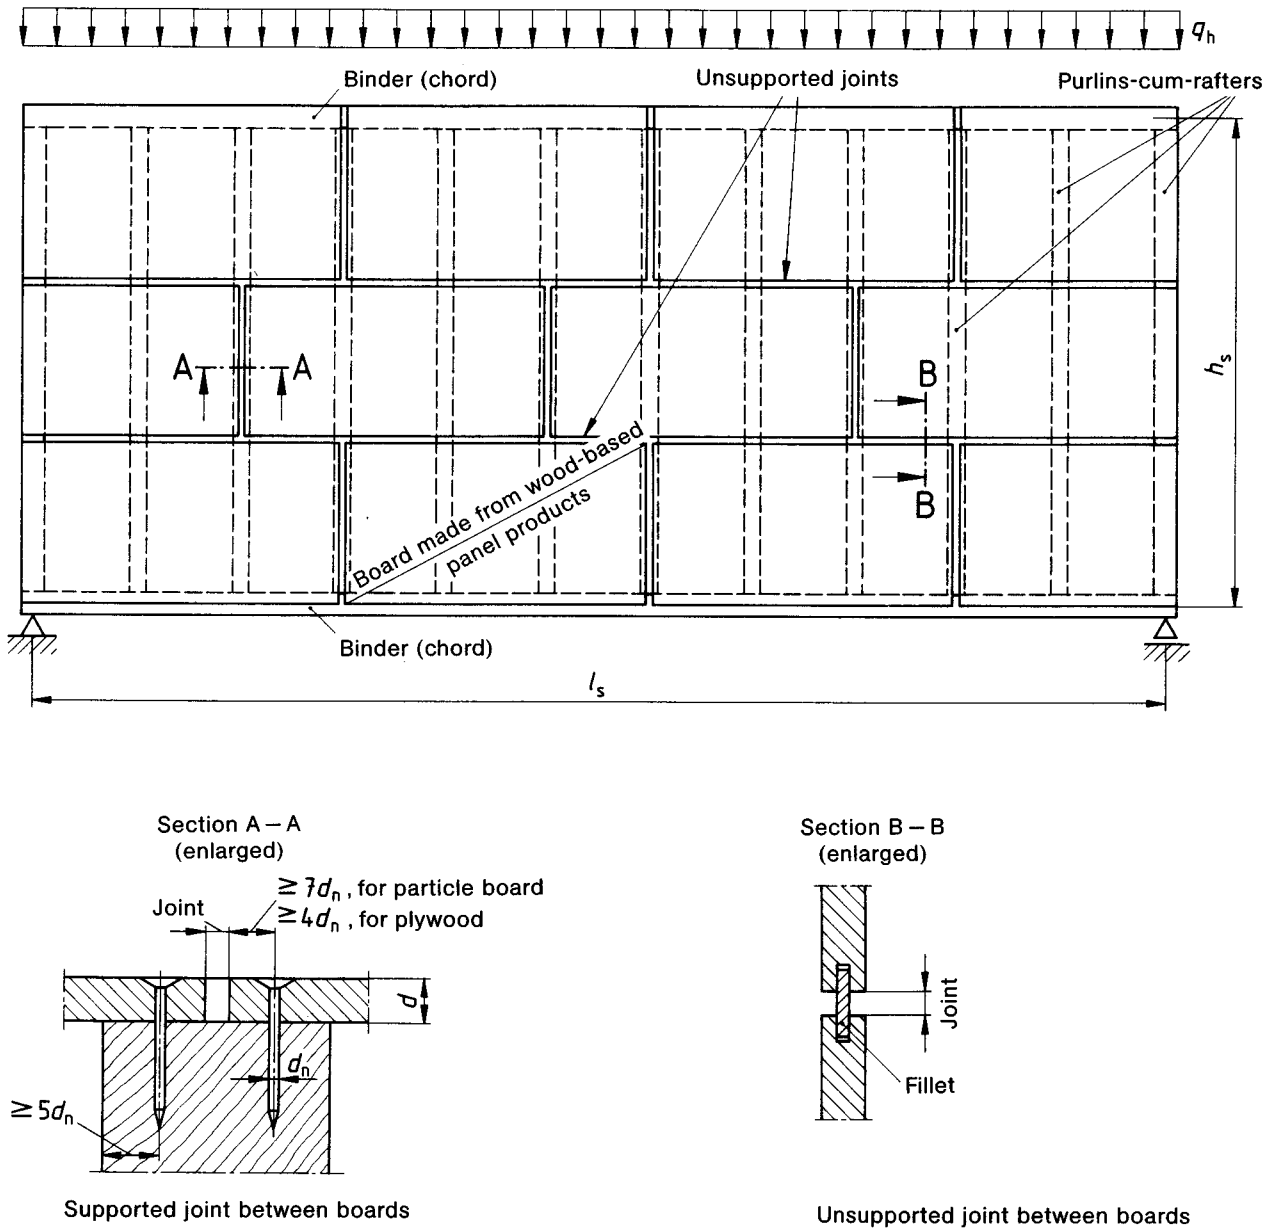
Stiffening plate with supported butt joints in the direction of loading and unsupported butt joints parallel to the span
